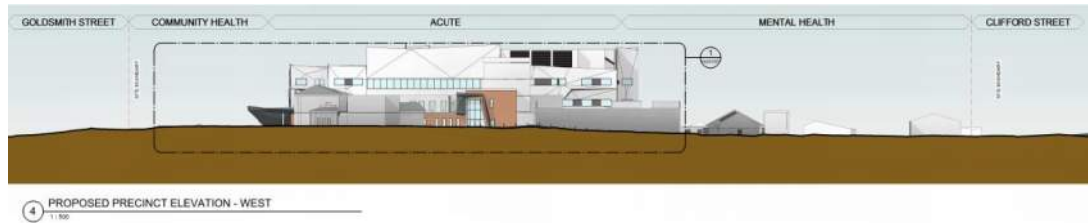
Precinct elevation showing the proposed works viewed from the west (Source: BLP)
